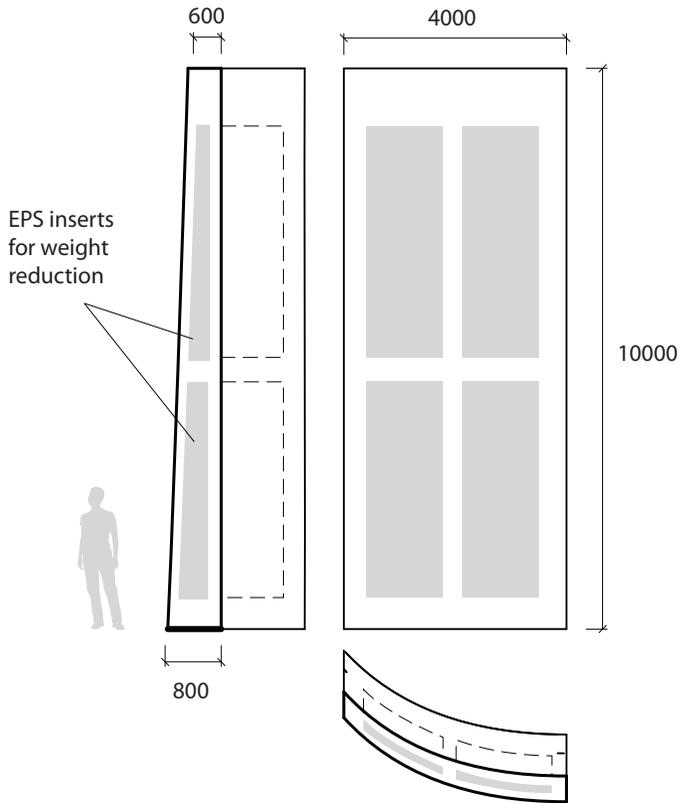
Plan and elevation drawing of a concrete element form the Kofta Wall. Scale 1:100
